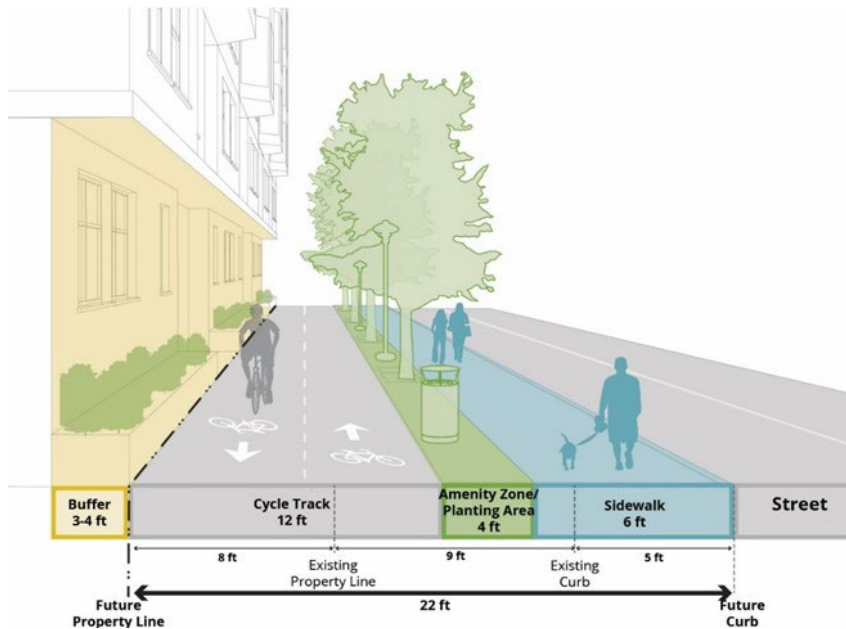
Diagram of MLK Jr Way - North of Station Entrance Plaza
